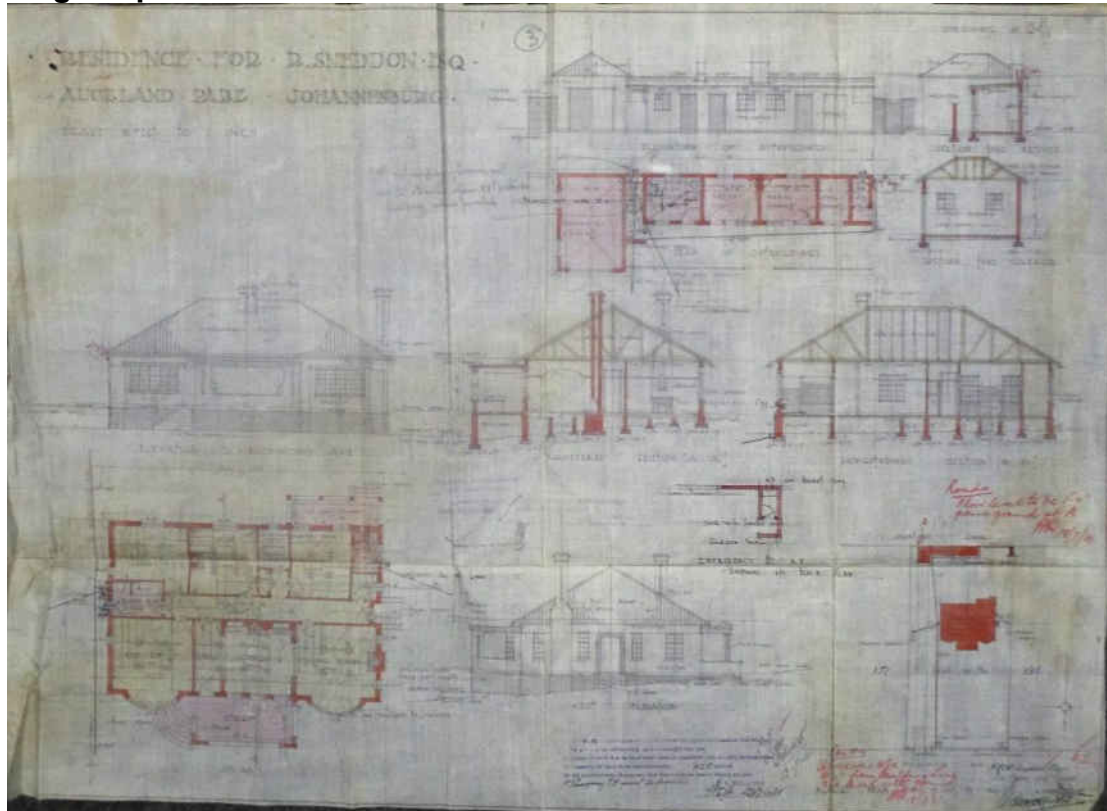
Original plan for residence for R. Sneddon built in 1935 by the well-known architectural firm J.C. Cook and Cowen (Source: City Council of Johannesburg, Plans Archive)
